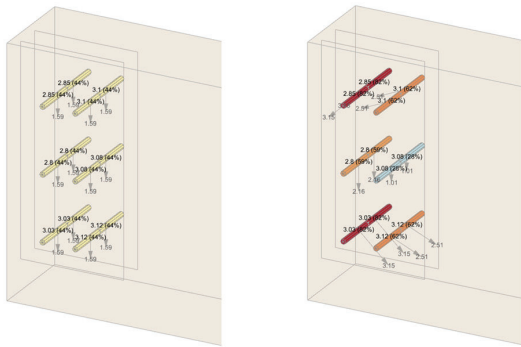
Calculated fastener utilization on a simple-span beam for a steel-to-timber connection adopting hinged (left) and semi-rigid (right) hypothesis
